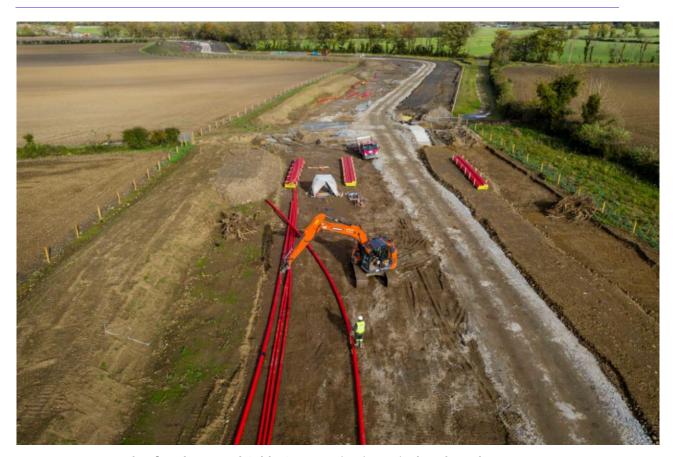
Example of Underground Cable Construction in Agricultural Lands
